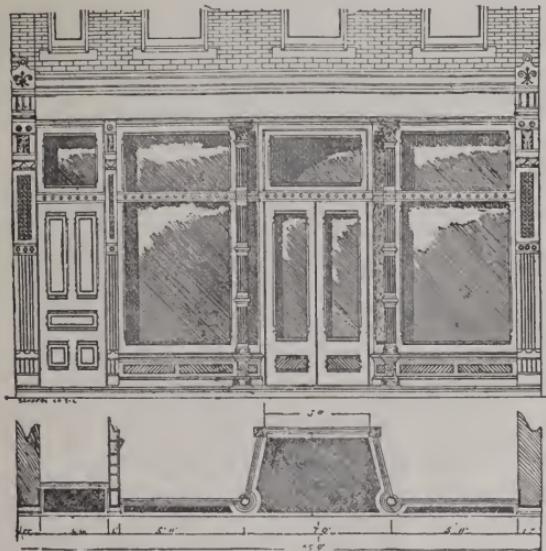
A—ELEVATION AND PLAN OF STORE FRONT.
